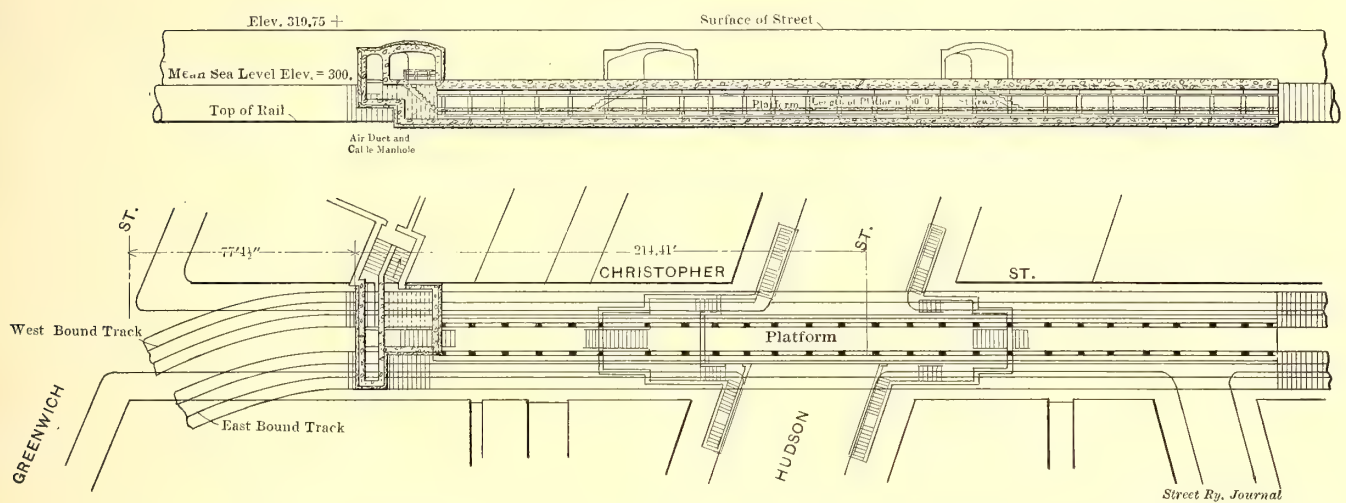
PLAN AND LONGITUDINAL SECTION OF THE HUDSON STREET STATION, NEW YORK
